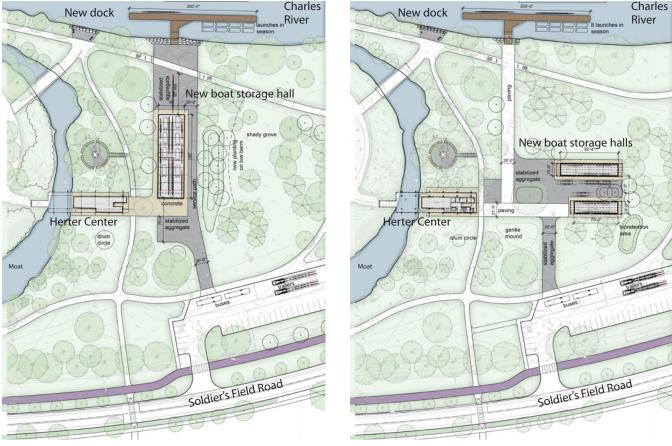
At left: High School Rowing Program Alternative 1, showing a single boat storage structure east of the Herter Center and pathways leading to a new dock. At Right: Alternative 2, showing two smaller boat storage structures and a courtyard. Enlargement plans and three-dimensional massing studies of the two site alternatives are found on the following pages.
